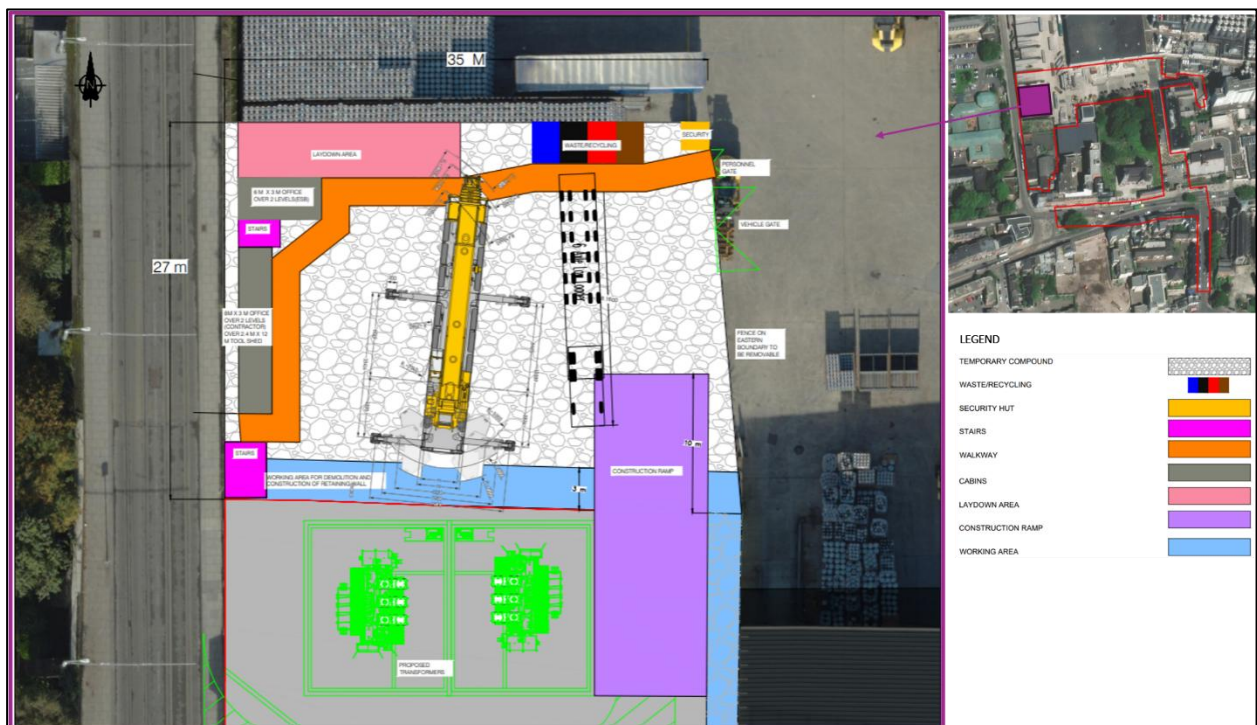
Preliminary Layout of Temporary Construction Compound (subject to detailed design)
